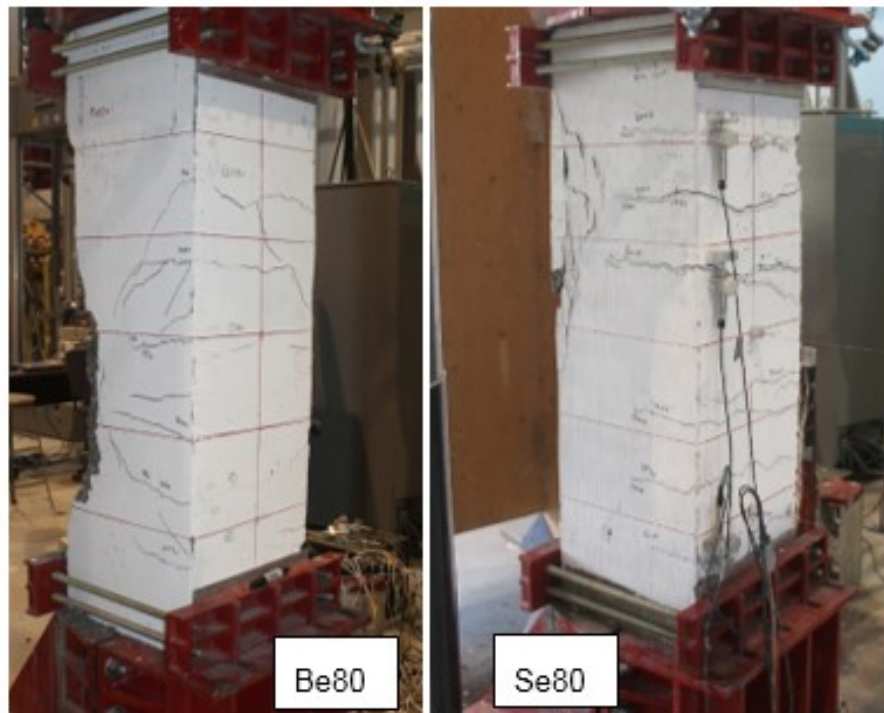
Crack pattern at failure of the tested columns at $e = 0.2 h$.
